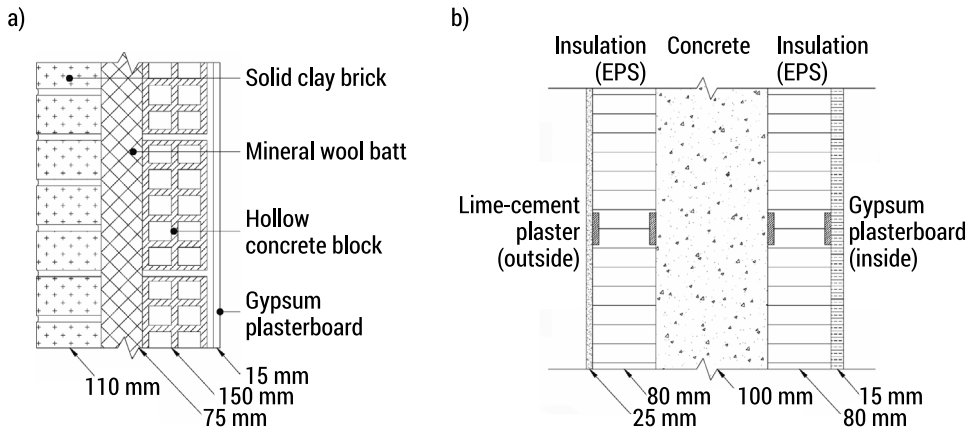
Exterior wall with section details a) – cavity wall system; b) – ICF wall system (Source: Broun et al., 2014)
